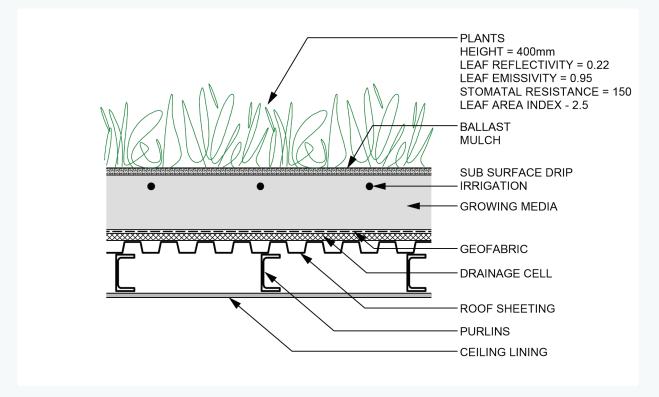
Green roof build up on metal deck used in modelling (Source: Authors)
